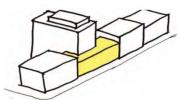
The base massing of this taller building should complement setbacks and heights of adjacent buildings.
